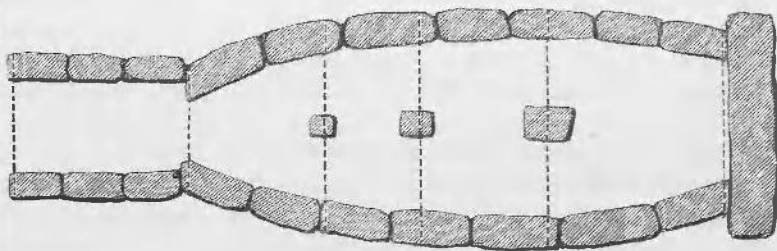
Ground plan. Length, about 86½ ft., greatest width 22 ft.
